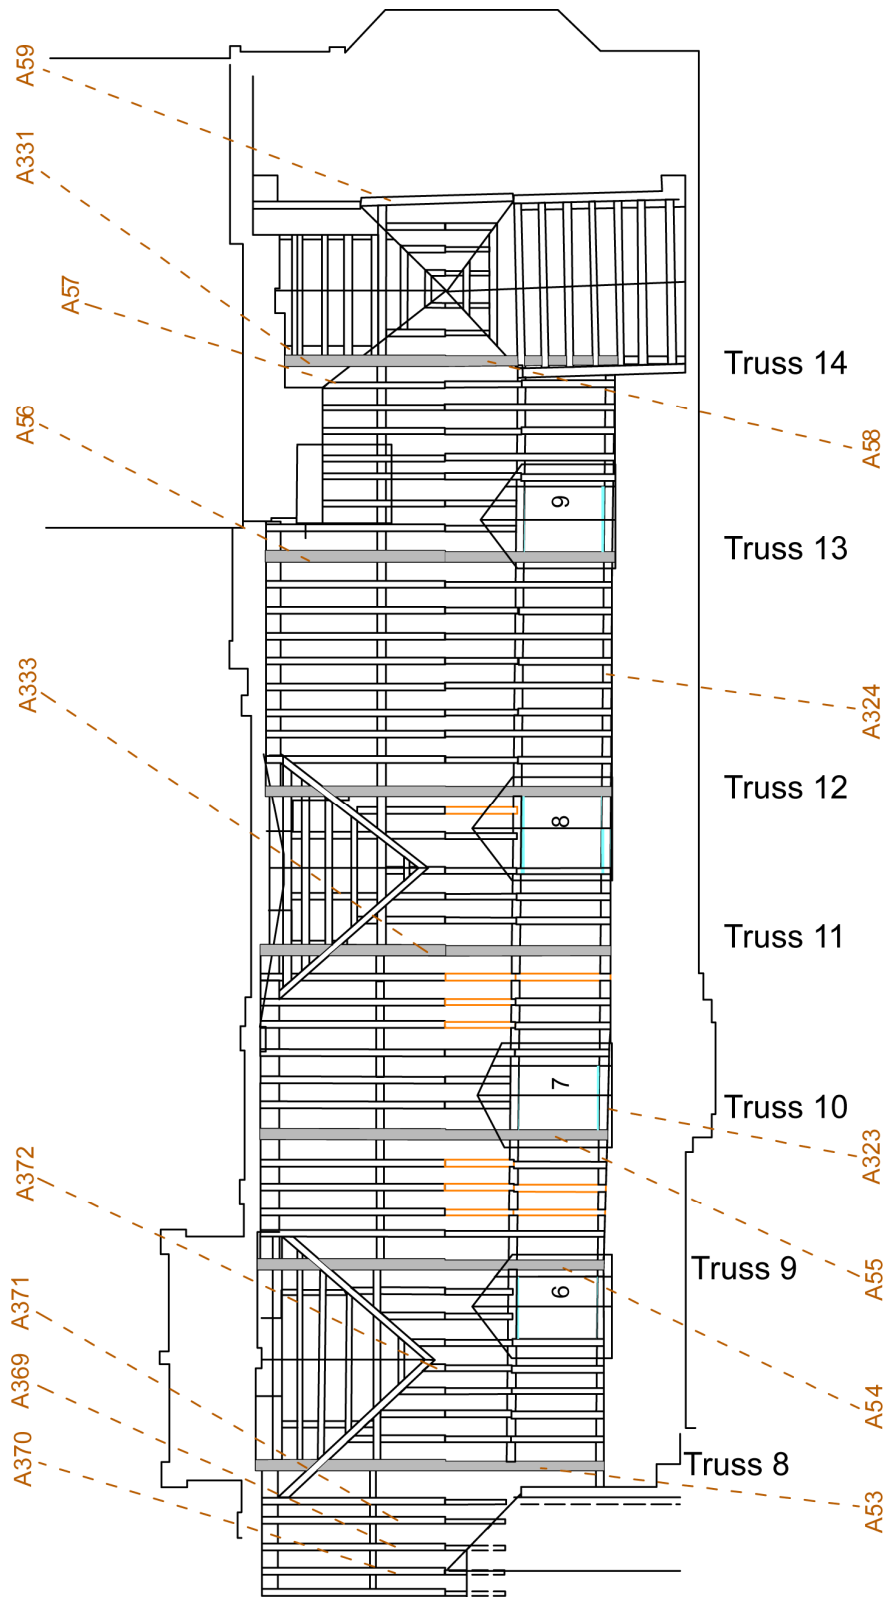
Roof plan of the East range, showing the locations of samples APT-A53–9, A323–4, A331, A333, and A369–72
